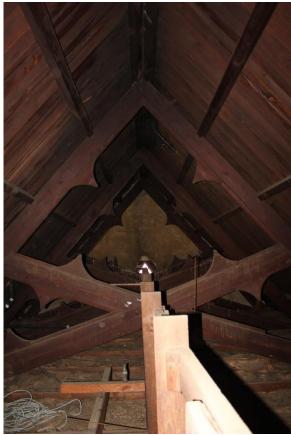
Fredericksburg Courthouse, attic, south wing, view to east. Detail scissor truss. Photograph 2015.
